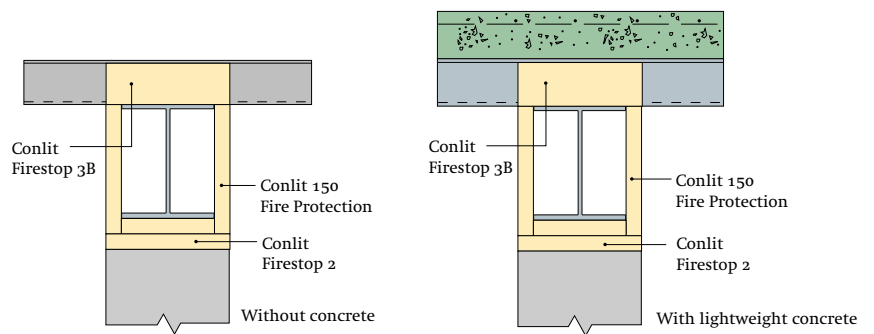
Profiled metal deck with or without lightweight concrete over universal beam
